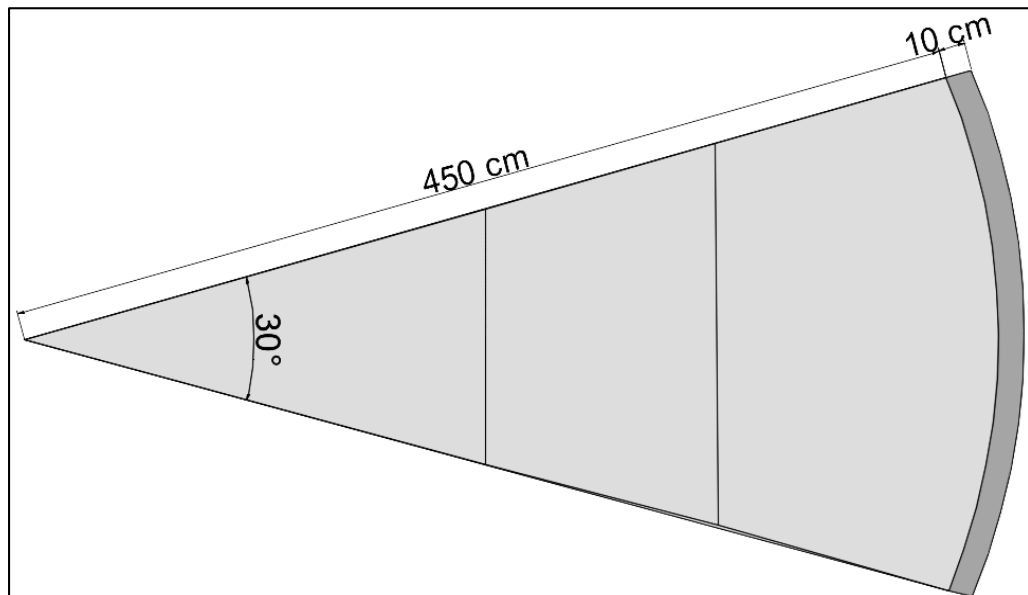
Top view of a concave dike segment with dimensions, opening angle and crest width.
